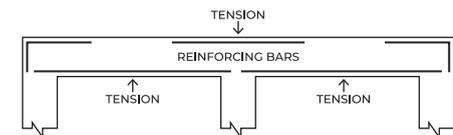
Typical Placement Of Non Prestressed Reinforcement
